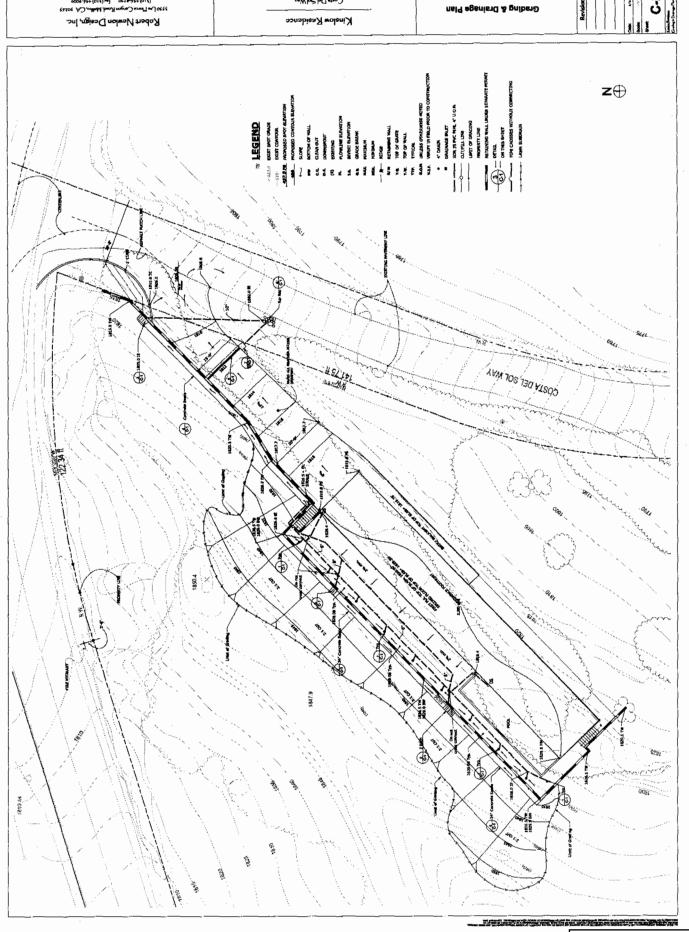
CDP 4-07-025 (Kinslow) Grading and Drainage Plans
